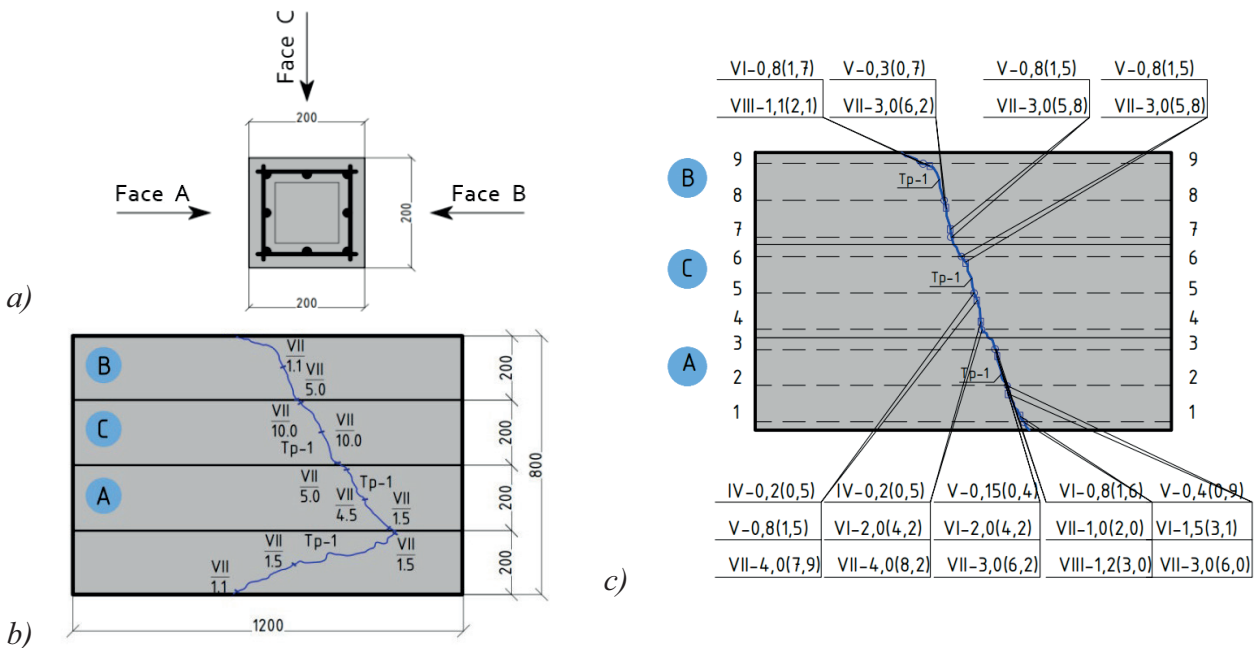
Cross section (a), single crack sweep pattern (b) and crack opening width on the faces of a high-strength concrete beam experiencing bending with torsion
